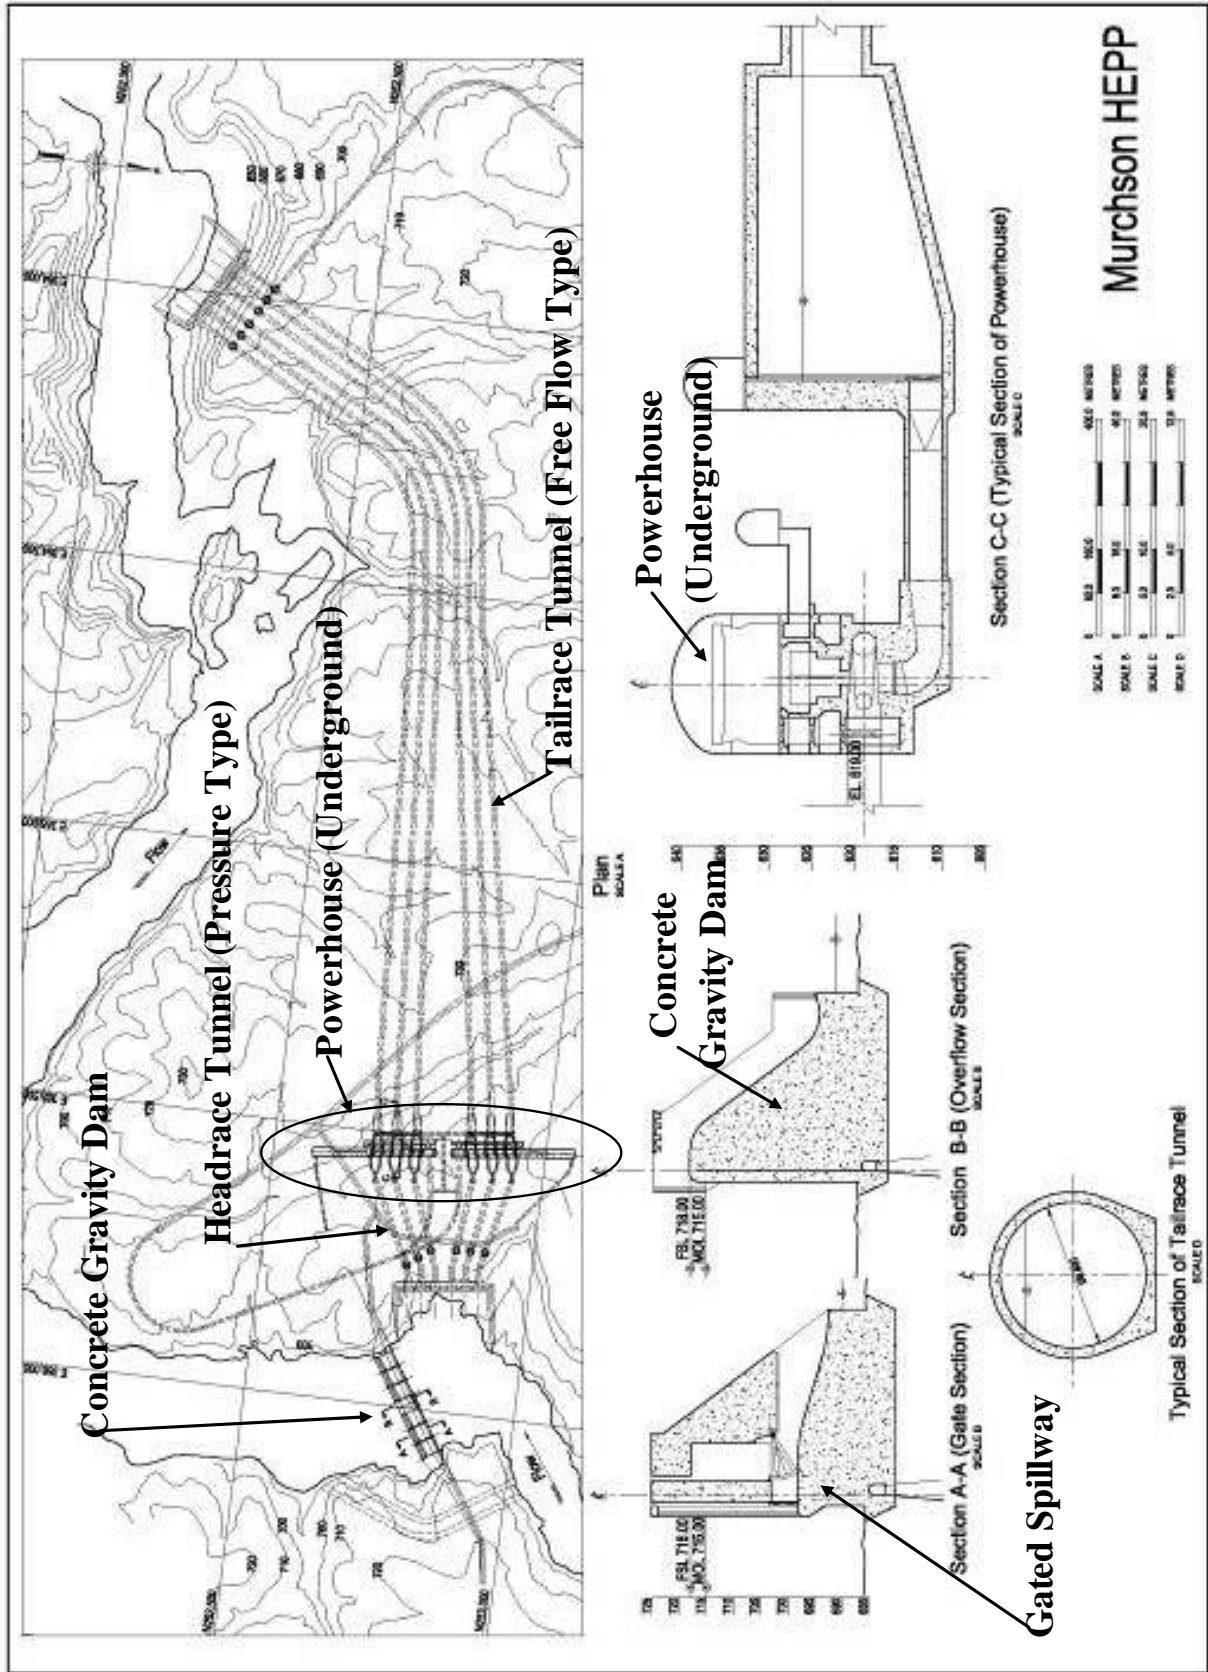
Murchison Site (Dam and Waterway Type)
